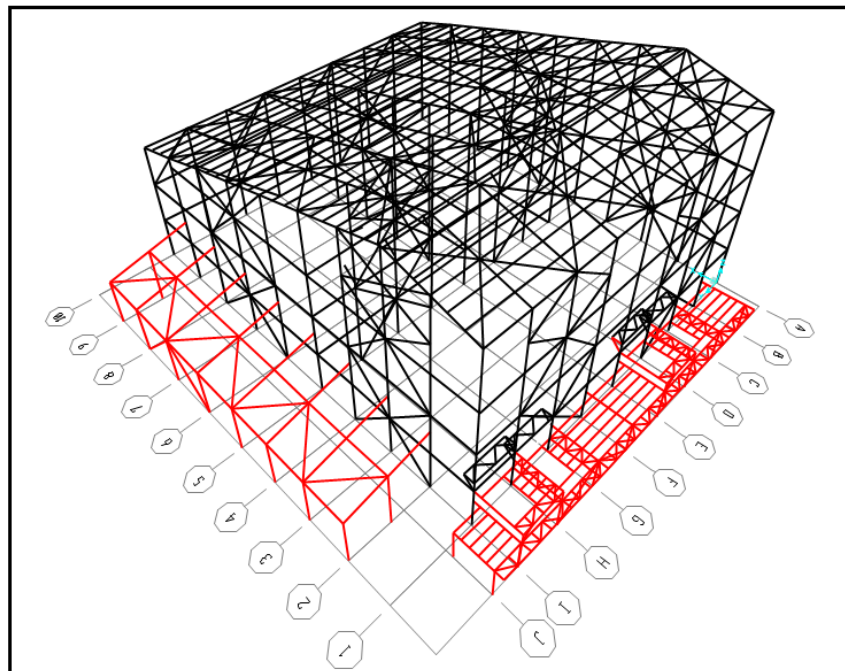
General Layout of the Adjacent Building and Out-building Platform.
